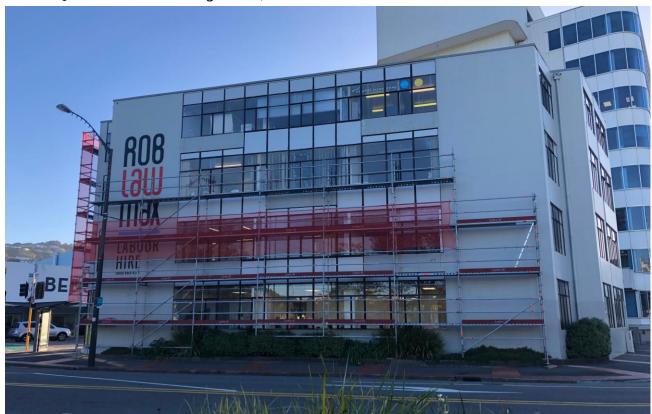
The NIMU Insurance Building at the corner of Queens Drive and Laings Road, Hutt Central
